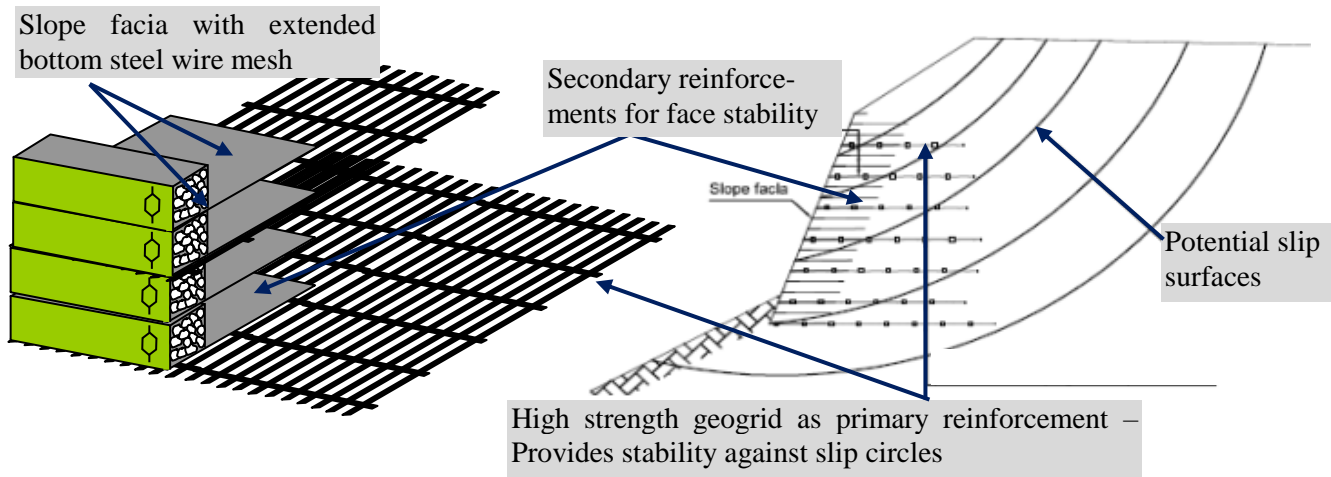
Typical sketch and mechanism of 'Composite reinforced soil system'
